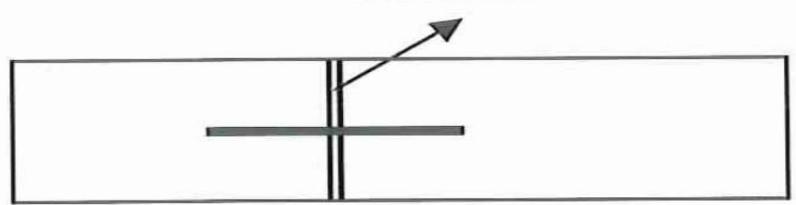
(b): Cross Section View of Butt Type Longitudinal Joint
